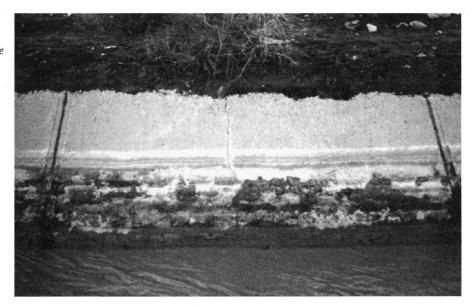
Cracking in concrete main wall of the Washington Fields diversion dam.
